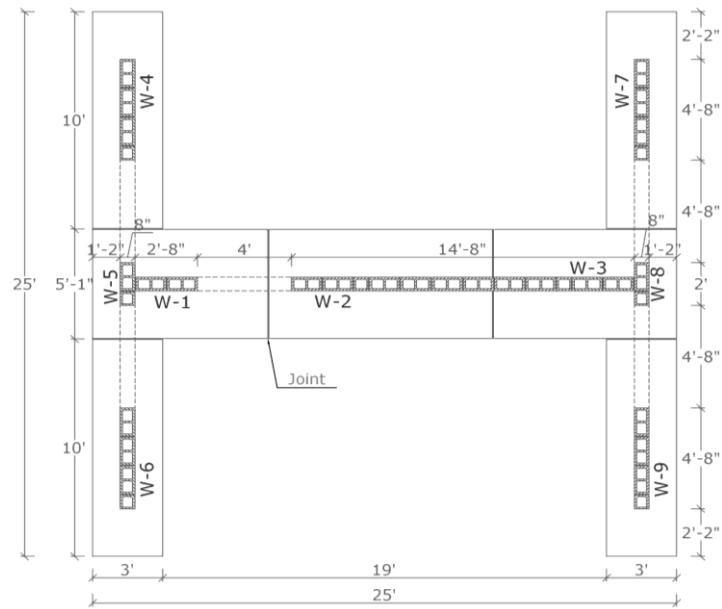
Plan View of Two-story Reinforced Masonry Wall-Slab Building System. Mavros, M. 2013. Personal Communication. Used under fair use, 2014.
